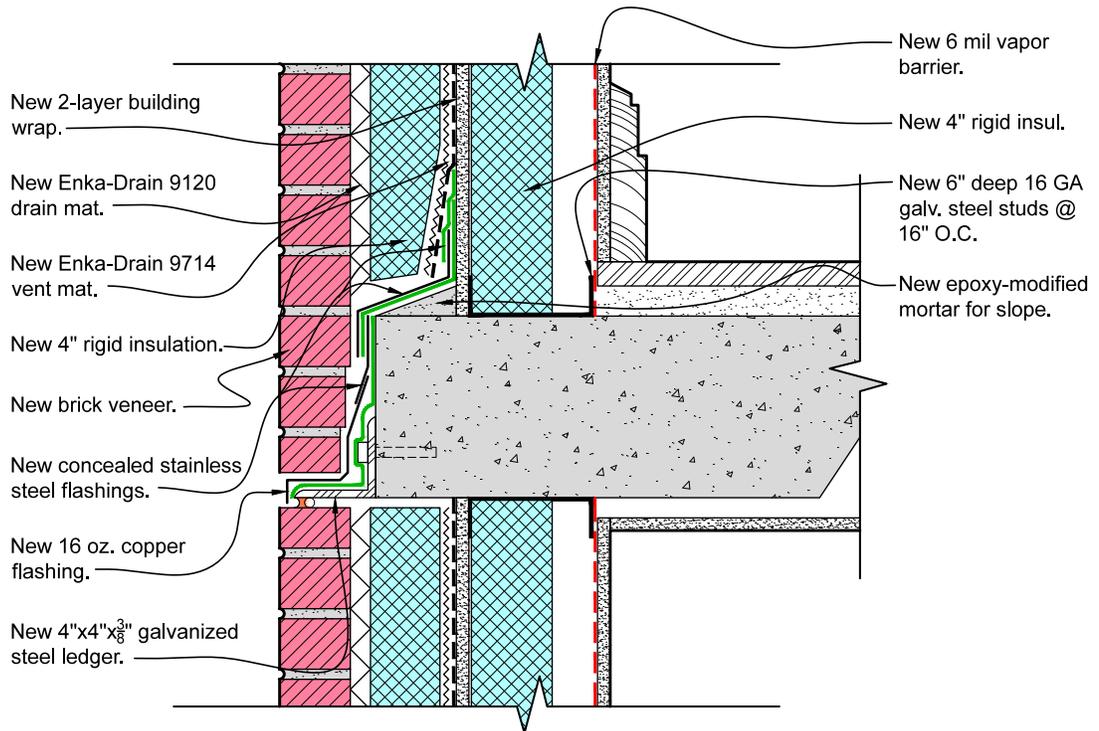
(2): Typ. New Brick Veneer Over New Steel-Framed Wall- Opt. 3 Only
